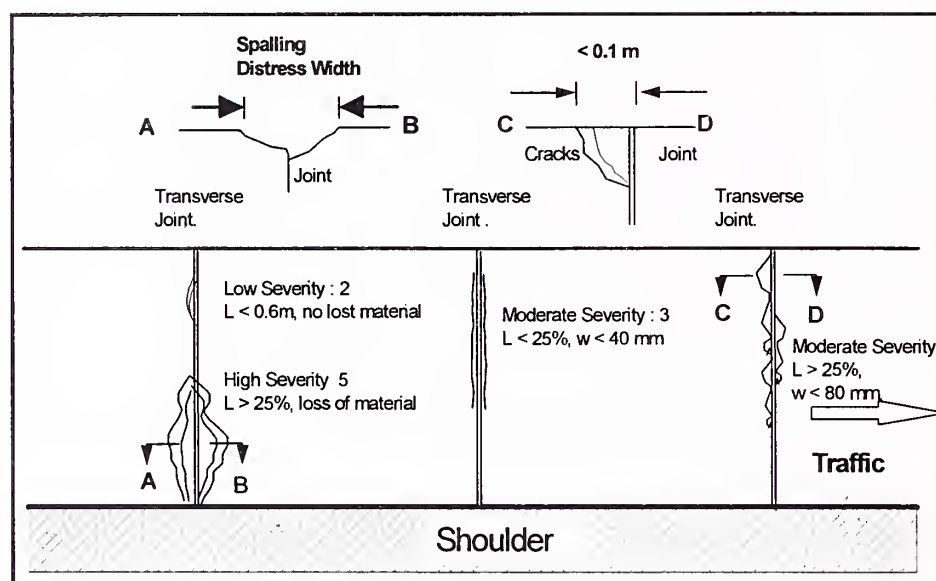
(b) Measurement of Spalling at a Joints
